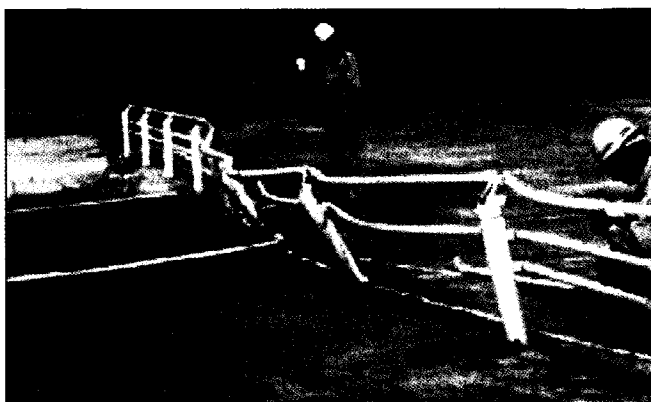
Dropping Situation of a Photographic Crossbeam
